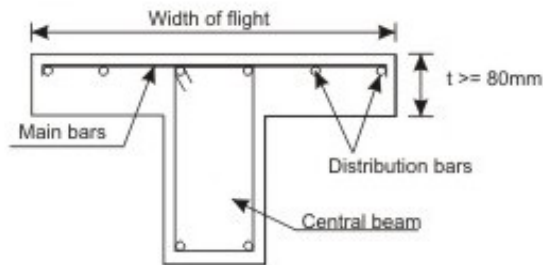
(c): Doubly cantilever slab from a central beam
